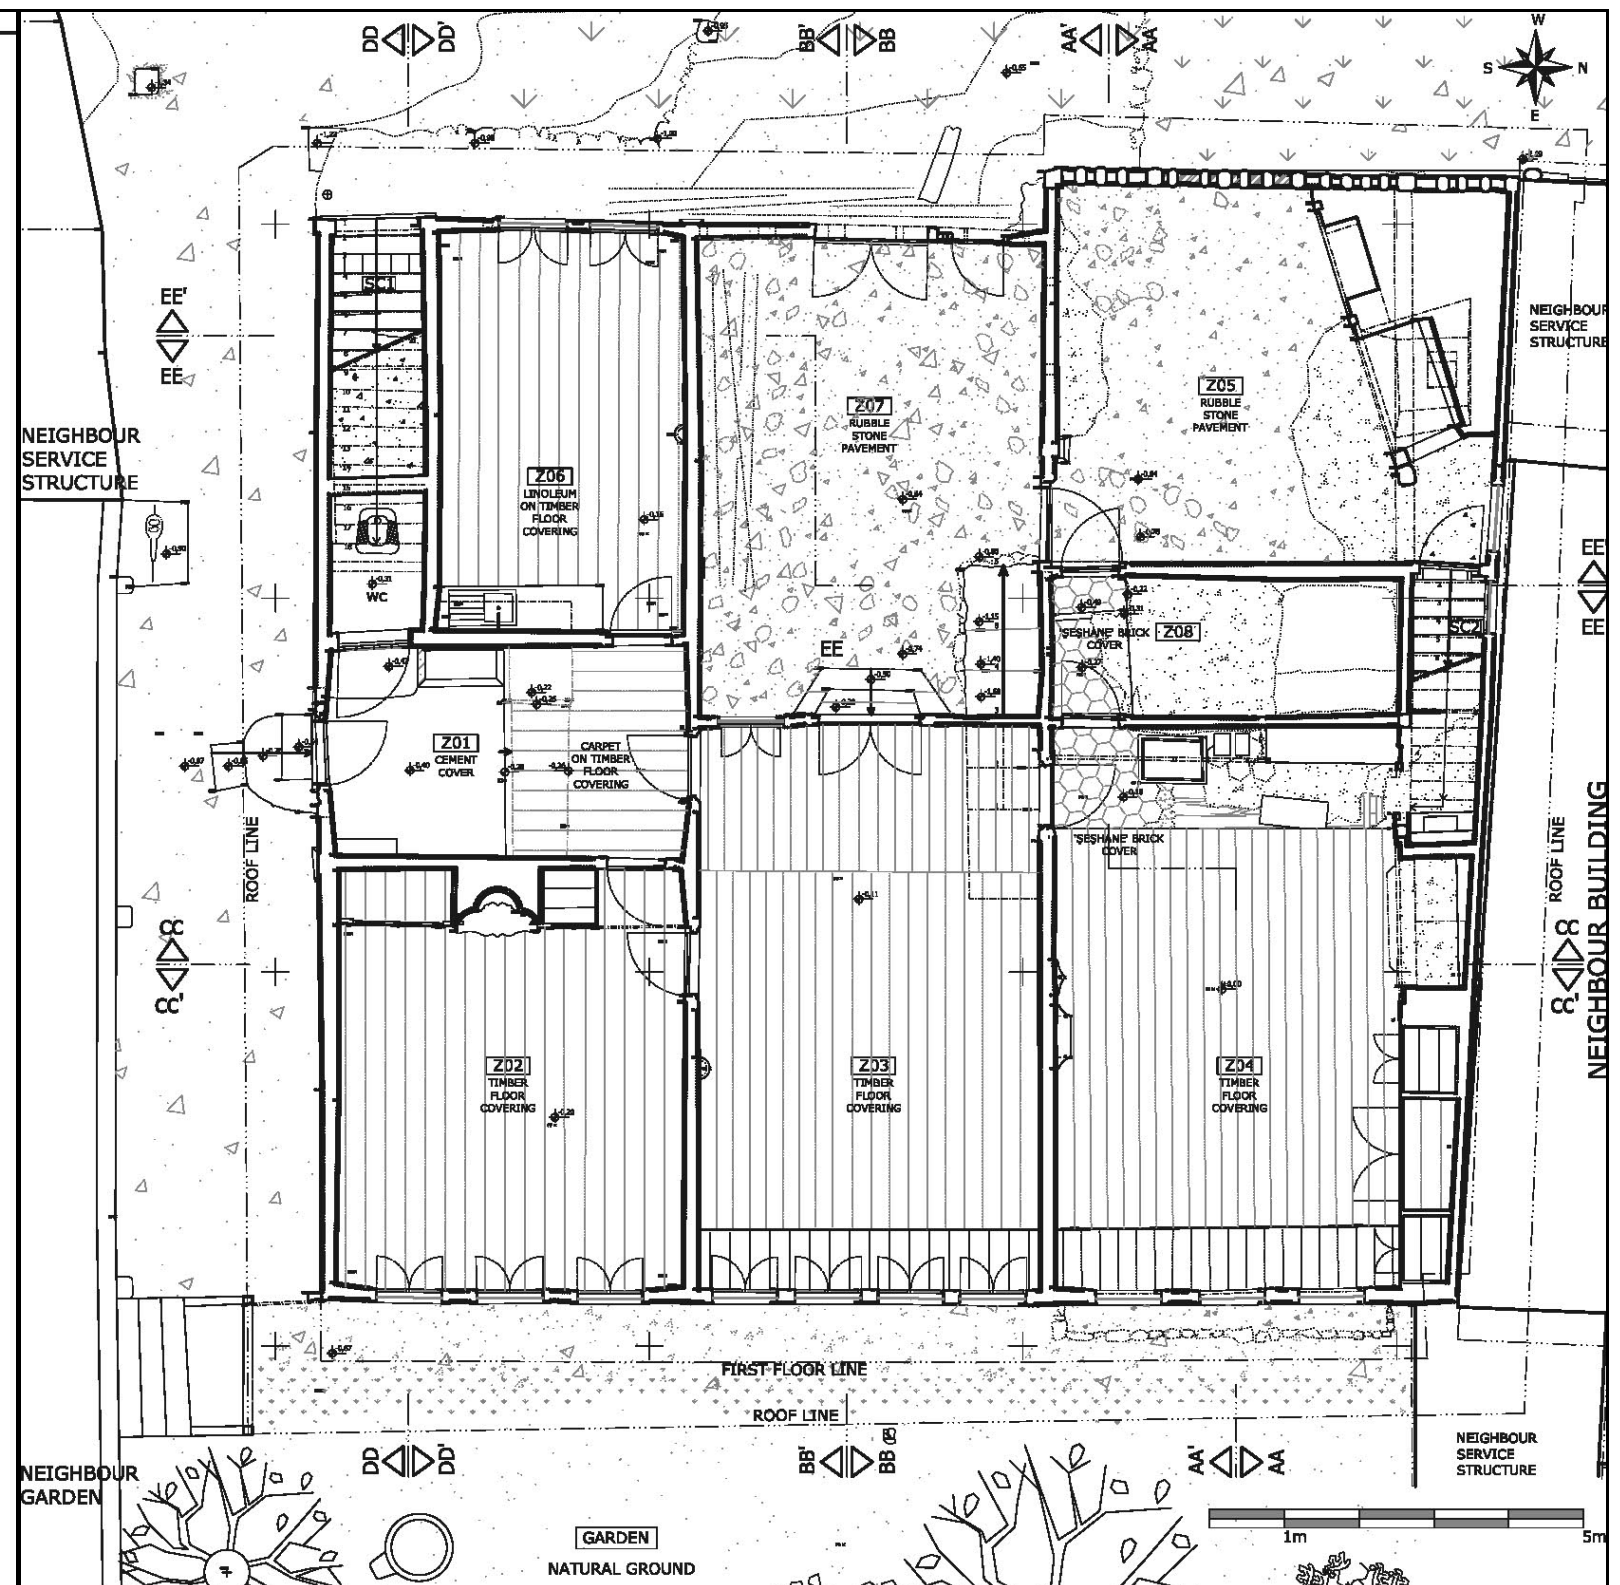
Ground Floor Flooring Plan: 1/100 (presented in 1/50 at Jury)
